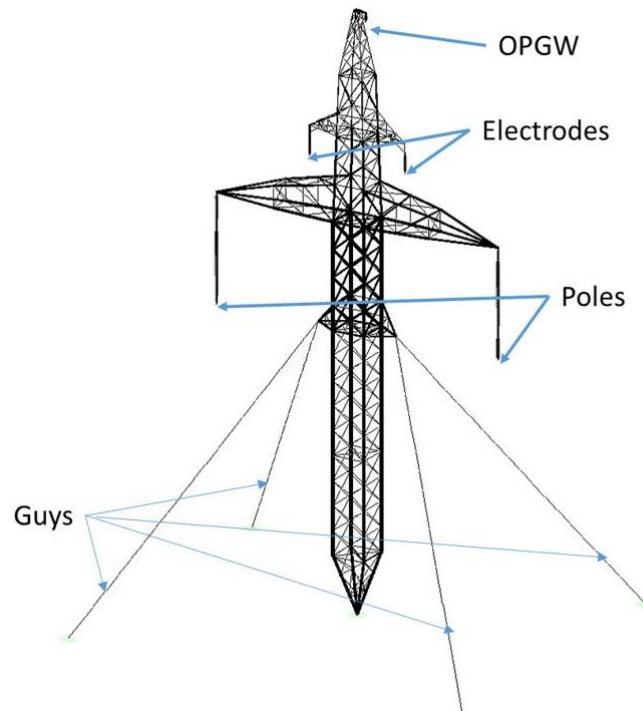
L3501/2 Suspension Structure Showing Wire Arrangement
